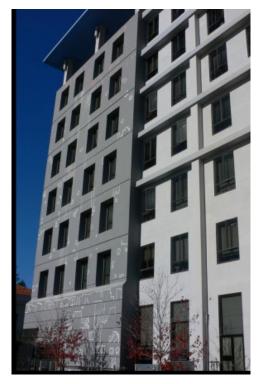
The thicker construction at the end of this building is a new concrete framework cast onto the existing structure for improved earthquake performance.
